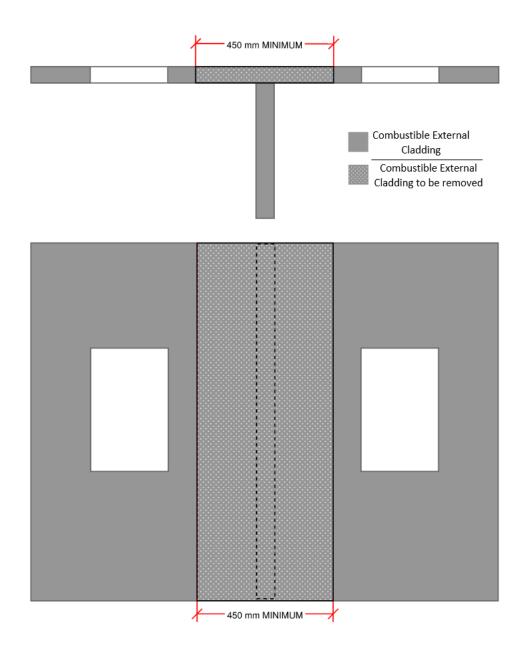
Plan view (top) and elevation view (bottom) of horizontal configuration cladding removal
